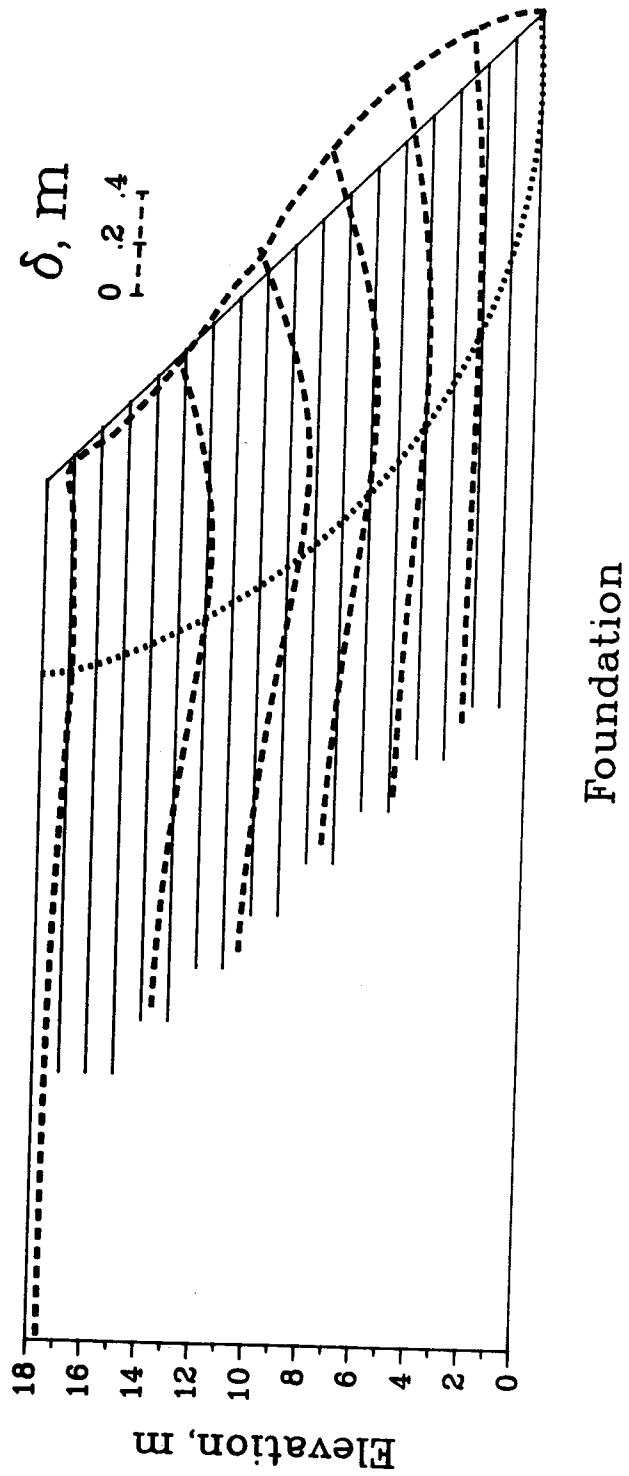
Deformed Shape of Reinforcement within the Reinforced Embankment,  $H = 18$  m
